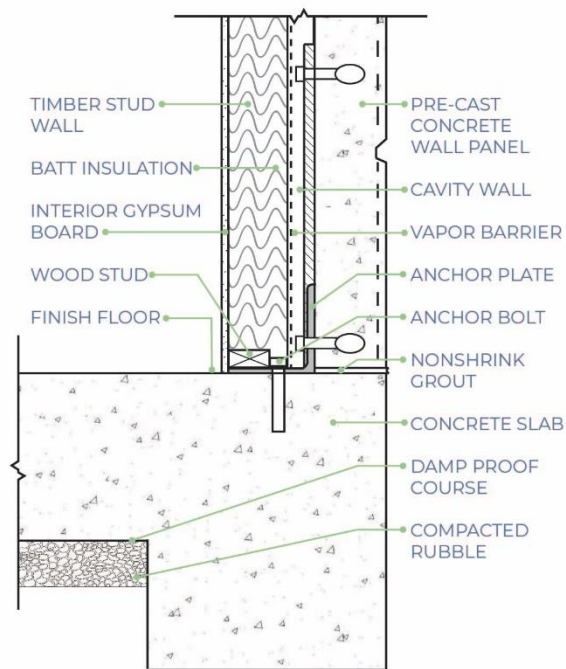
Precast Concrete Wall Detail (modeled by Anne Manstrom, 2024)
